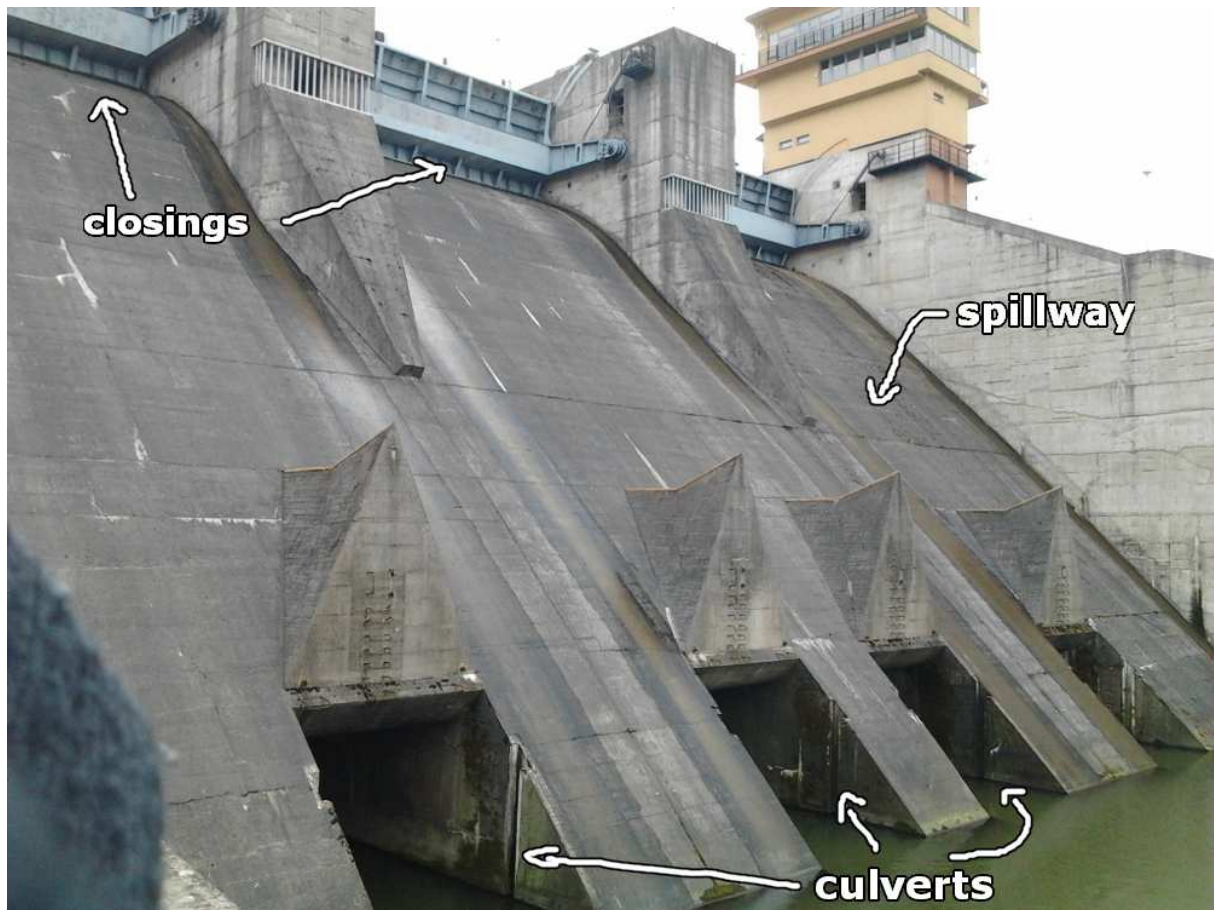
A concrete section with spillway and culverts on an earthen dam in Dobczyce, Poland. Culverts often are located in one section with spillway, but that's not necessary – they can be placed in various places, including under the dam or drilled trough the bedrock on the side slope. Source: own work.
